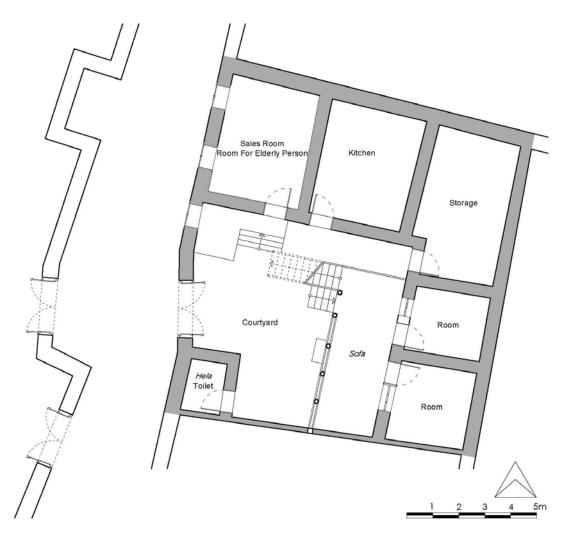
The plan of the ground floor of Kestaneciler House.
